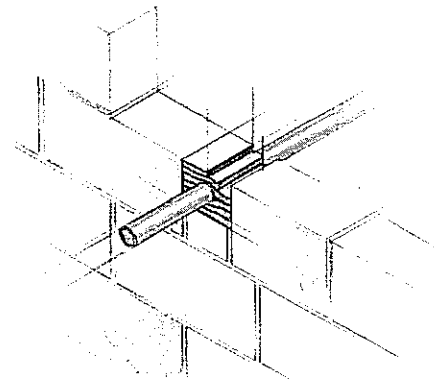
Sealmaster Intumescent plaster sealing a single metal pipe through a blockwork wall
